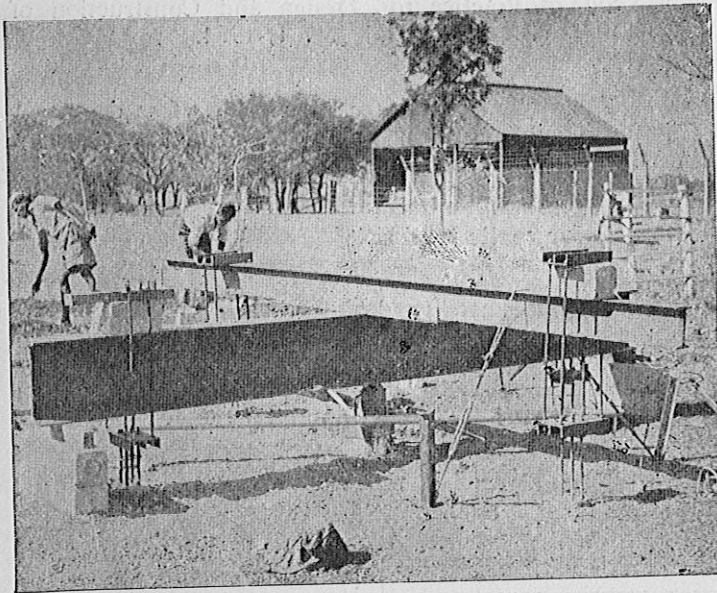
LOAD TEST SET UP WITH ANCHOR PILES
